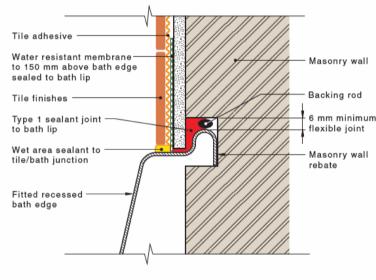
(A) — Bath with no shower over it — Fitted bath — Masonry wall
